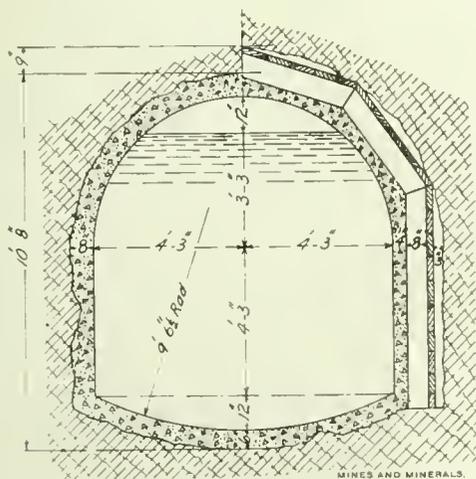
SECTION OF TUNNEL No. 17, JAWBONE DIVISION
